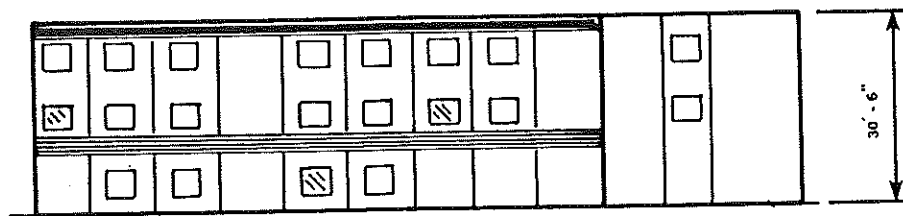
shows a typical elevation and a typical floor plan of the structure. The foundation consists of 1' 4" deep reinforced concrete strip footings.
